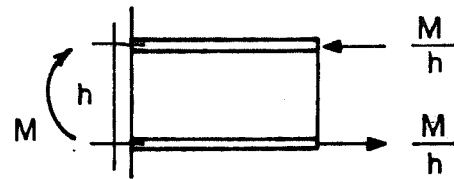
Longitudinal bending moment and flange forces in girder section.
